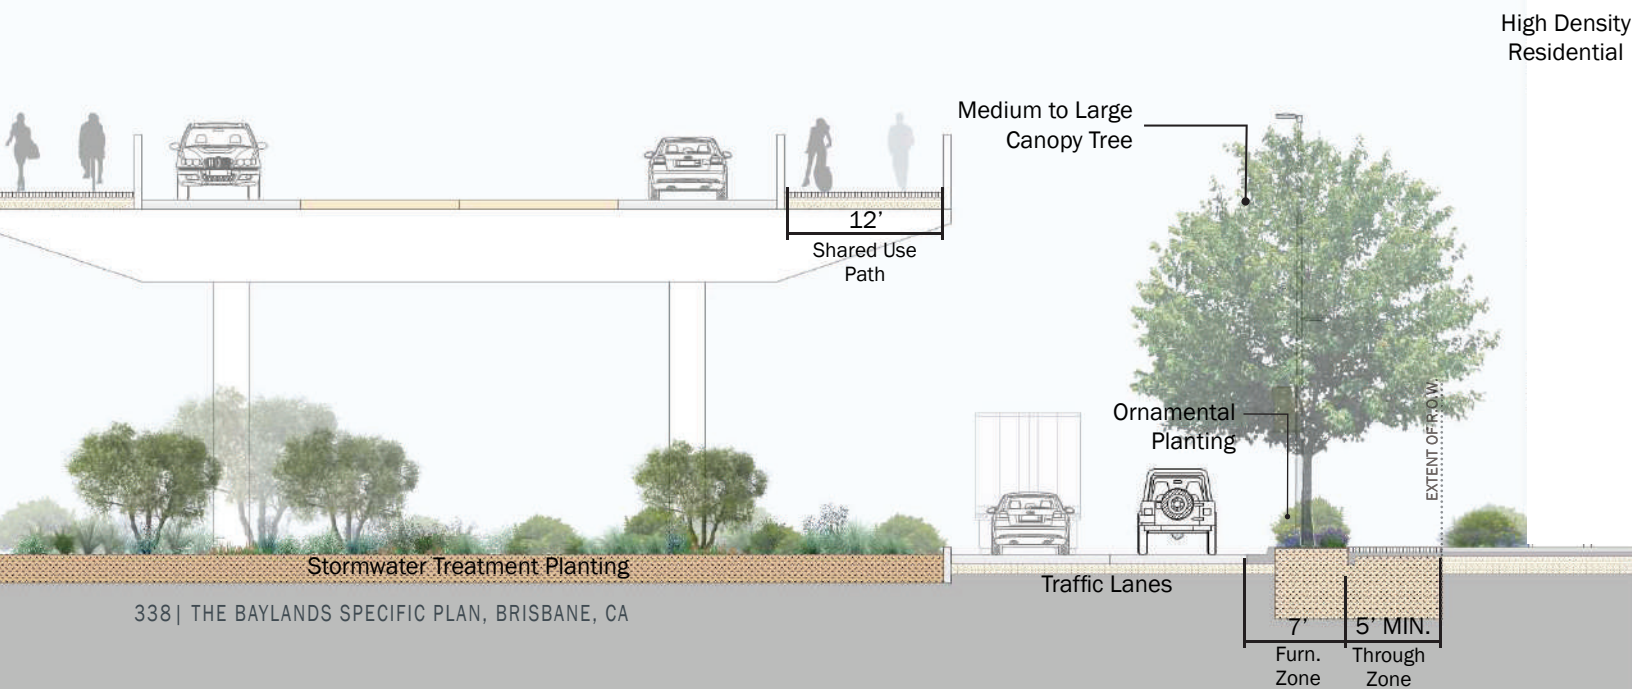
GENEVA AVENUE BRIDGE SECTION
